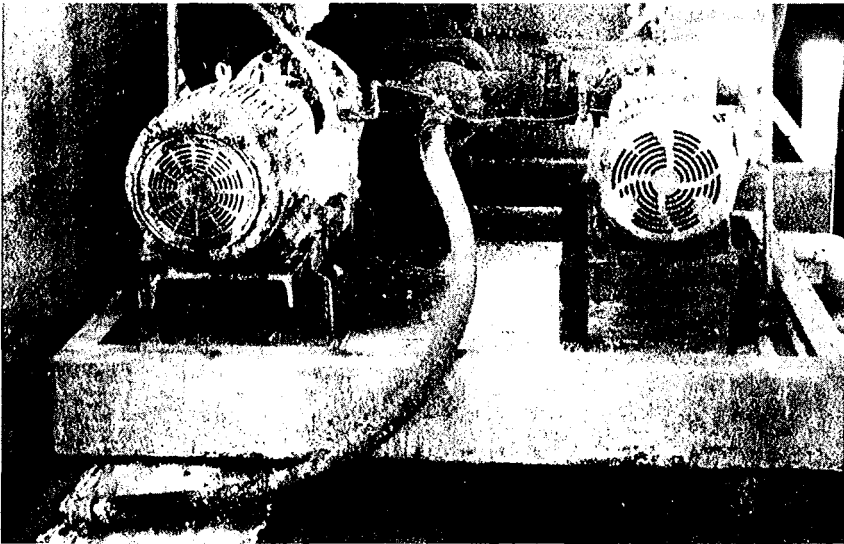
SC floor, wall, column protection and pump foundation/acid sump combination exposed to sulphuric and phosphoric acid in a phosphate fertilizer production facility
